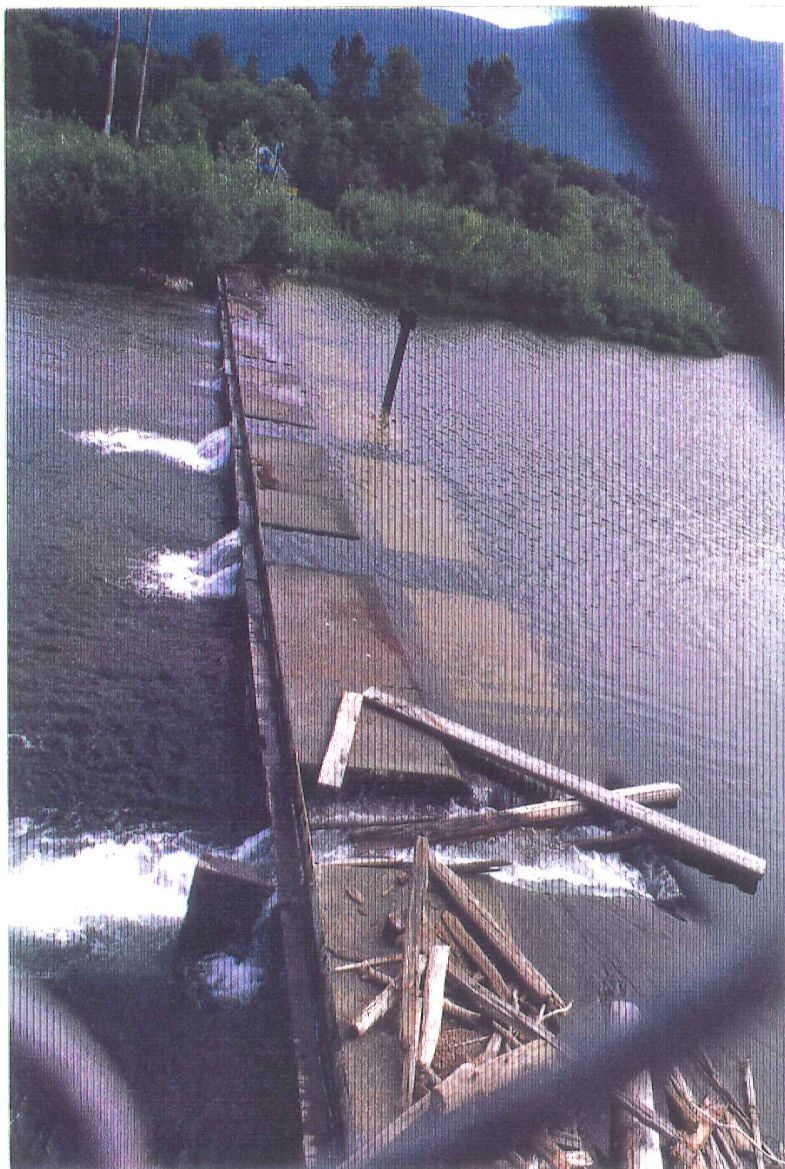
Looking toward timber crib structure from the boat lock with the Lake level near the existing full elevation.
